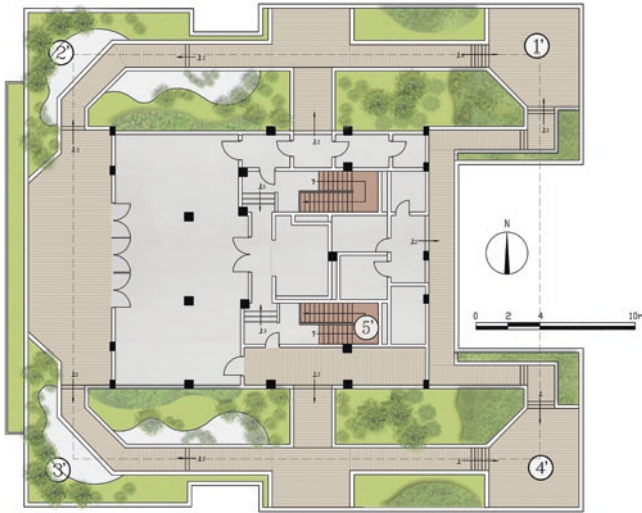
Test points after construction of the roof garden. Test point 1' was located at the northeast of the roof garden, test point 2' was located at the northwest of the roof garden, test point 3' was located at the southwest of the roof garden, test point 4' was located at the southeast of the roof garden, and test point 5' was located indoors on the 12th floor of the building
